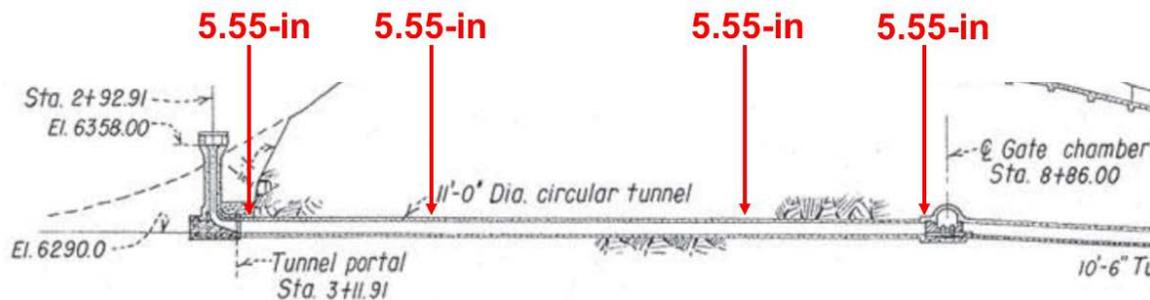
Locations for four 5.55-in air vents installed on the Paonia outlet tunnel model.
